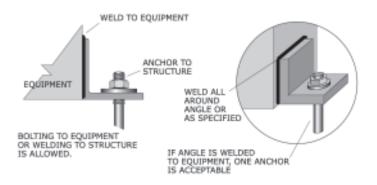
Four or more angles welded to equipment and bolted to the floor/pad.
